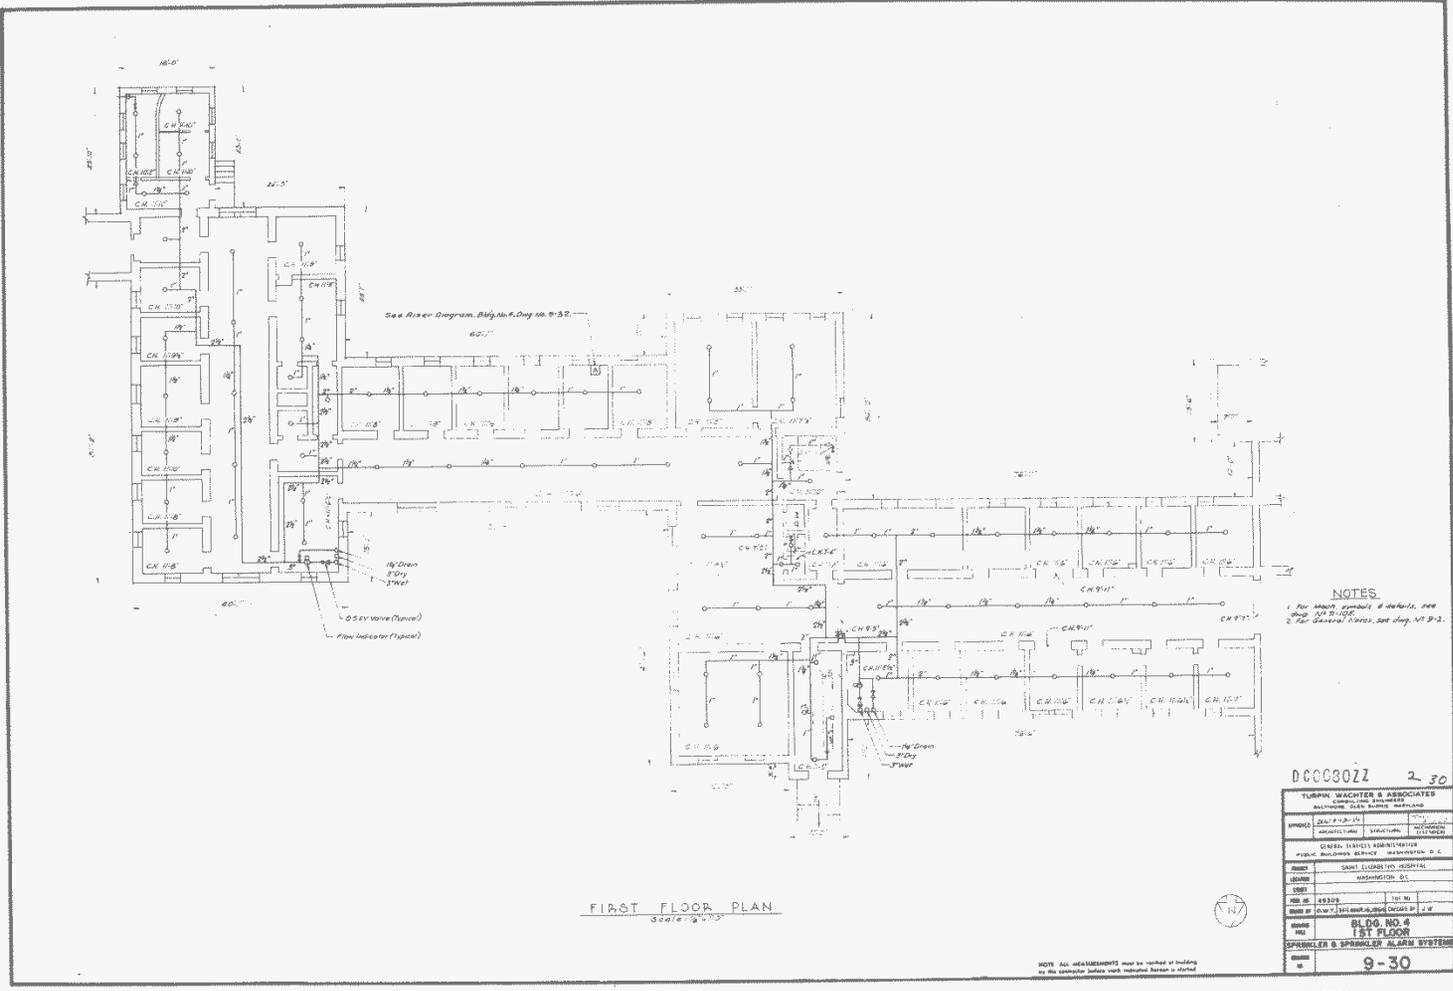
First floor plan of the East Wing outlining fire suppression system improvements, 1964. Source: GSA archives, image DC0080SE0002.
